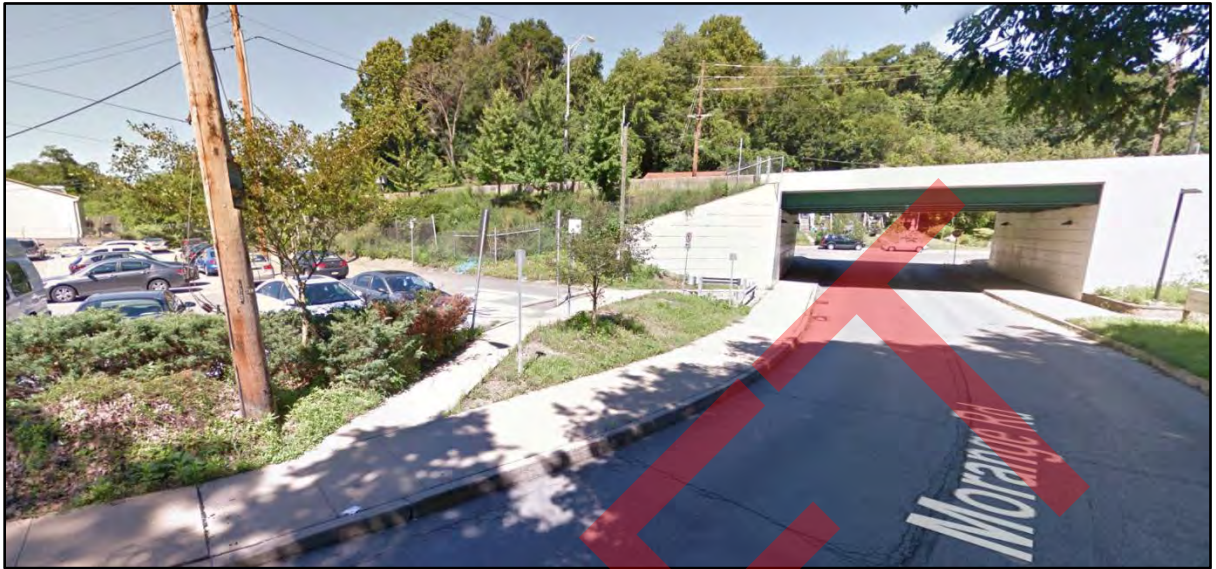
Culvert at the Morange Road Flooding Location (Multiple Inlets Near Underpass)
